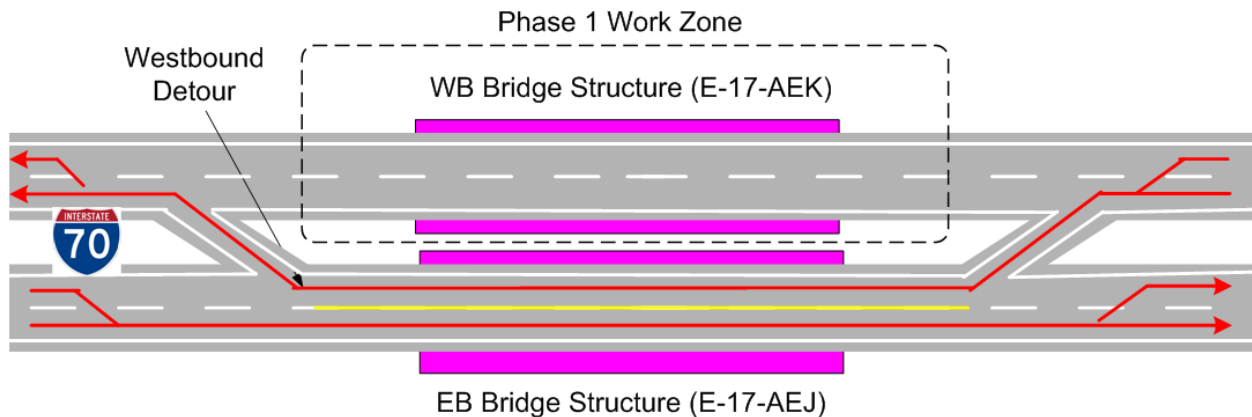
Diagram. Traffic maintenance plan for construction Phase 1 (westbound).
